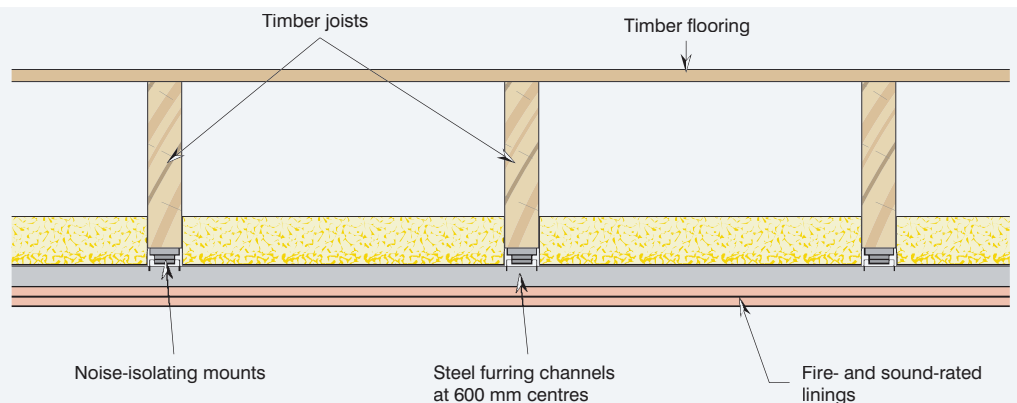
Fire- and sound-rated timber-framed floor – elevation view.
